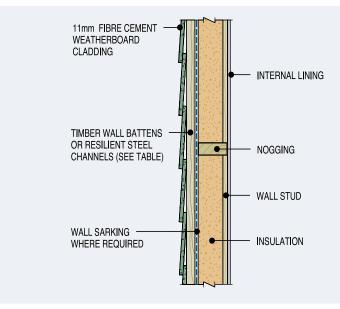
11 mm Fibre Cement Cladding. Vertical section through wall
